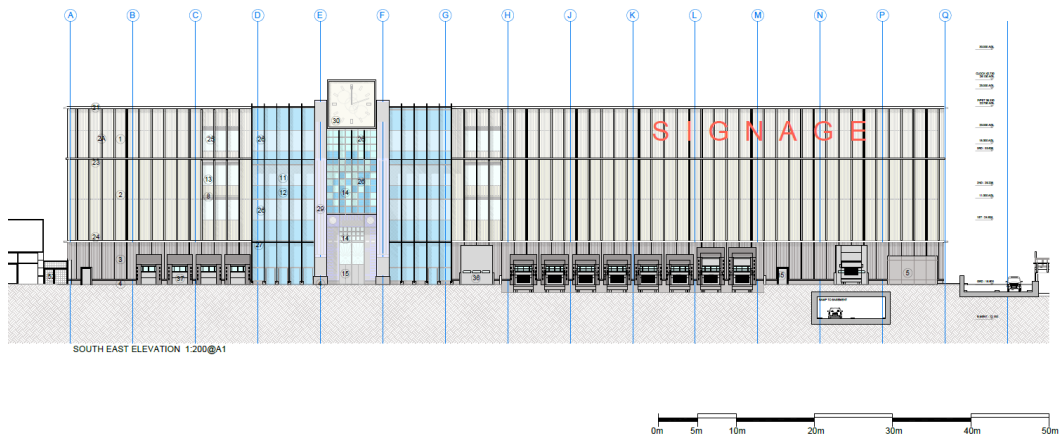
Proposed South East Elevation (facing A4 Great West Road)
